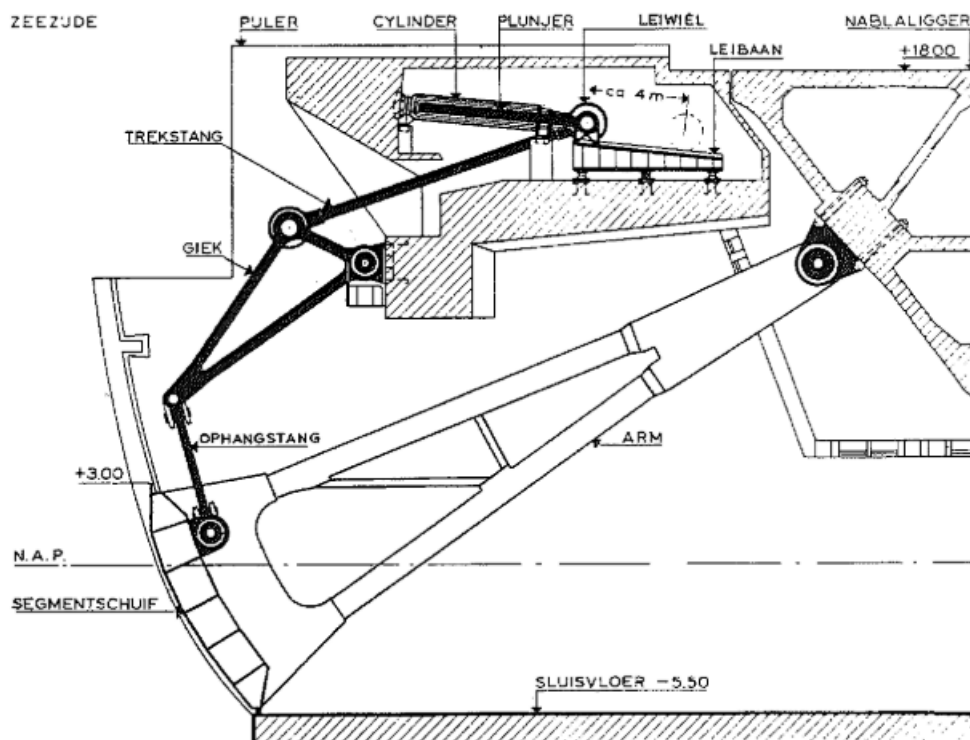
Detailed drawing of the connection of the sluice doors via the arm to the Nablo beam. Image from Ferguson (1971).
